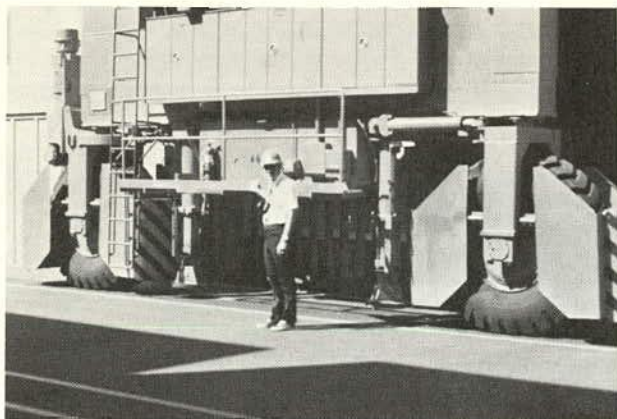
Transtainer and storage bins at the Portland, Ore., Marine Terminal with LFA pavements.
